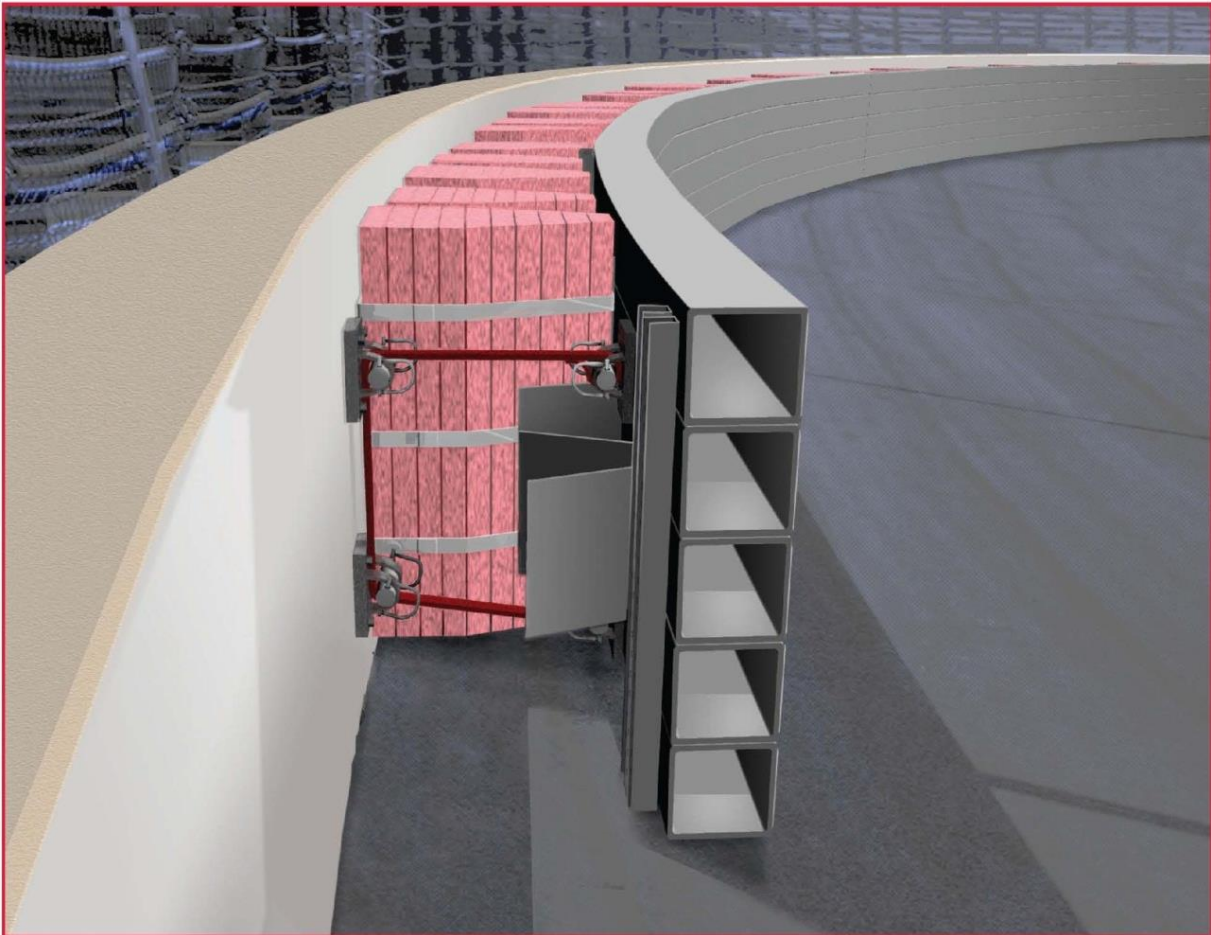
Cross-Section of the SAFER Barrier Installed on Rigid Concrete Wall
